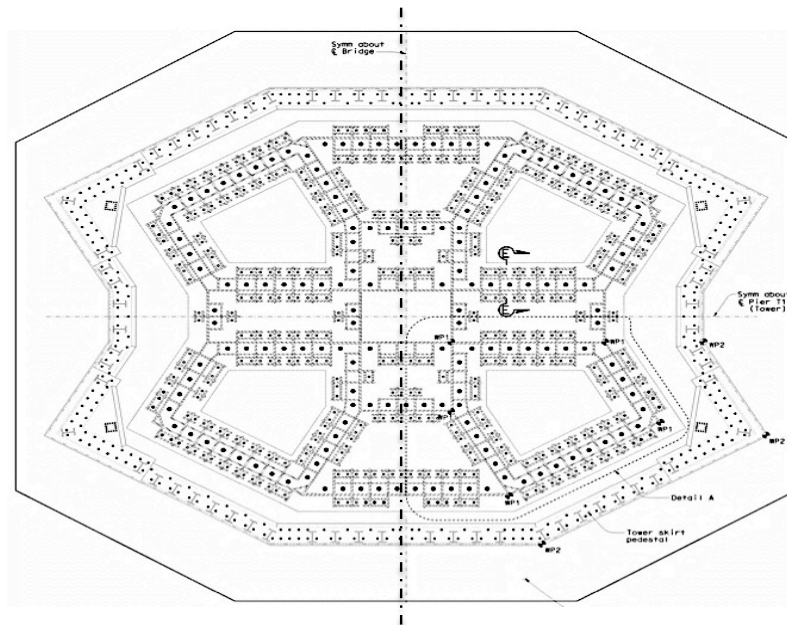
Plan view of dowels and anchor bolts on the tower base [Ref.: Caltrans].
